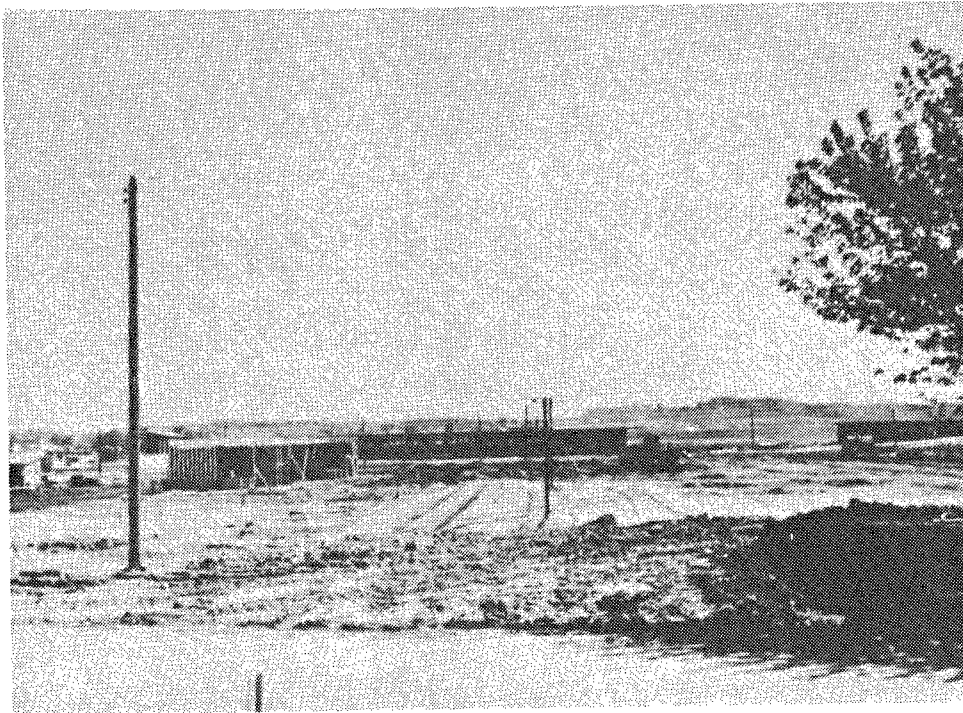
Overview of LCOP Ballistics building construction, 1941 (original photograph on file, LCAAP).
